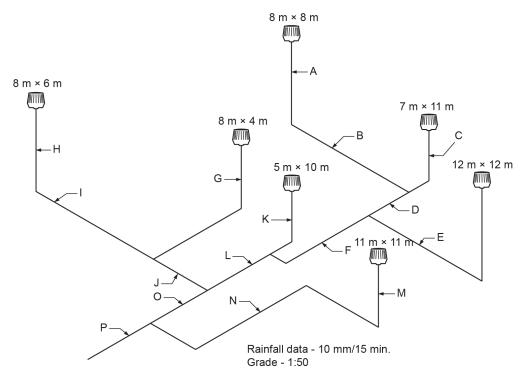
Storm drainage system example. (Skilled Trades BC, 2021) Used with permission.
